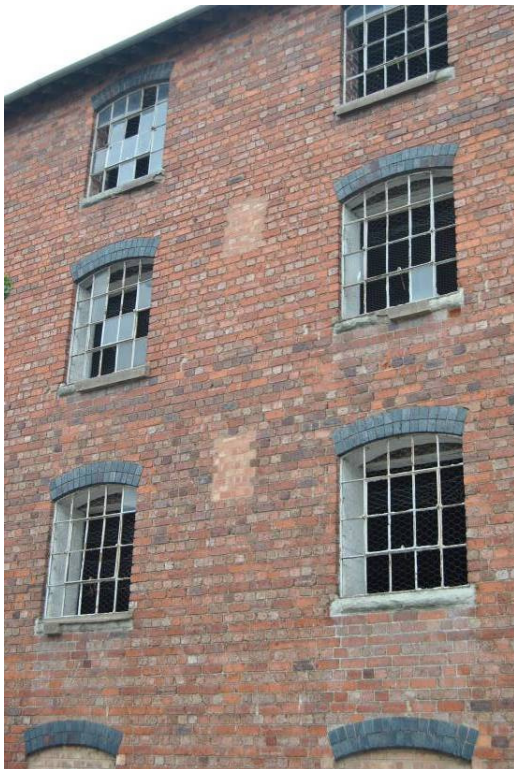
Areas of patching at bay intervals evidence insertion of secondary steel beams.
